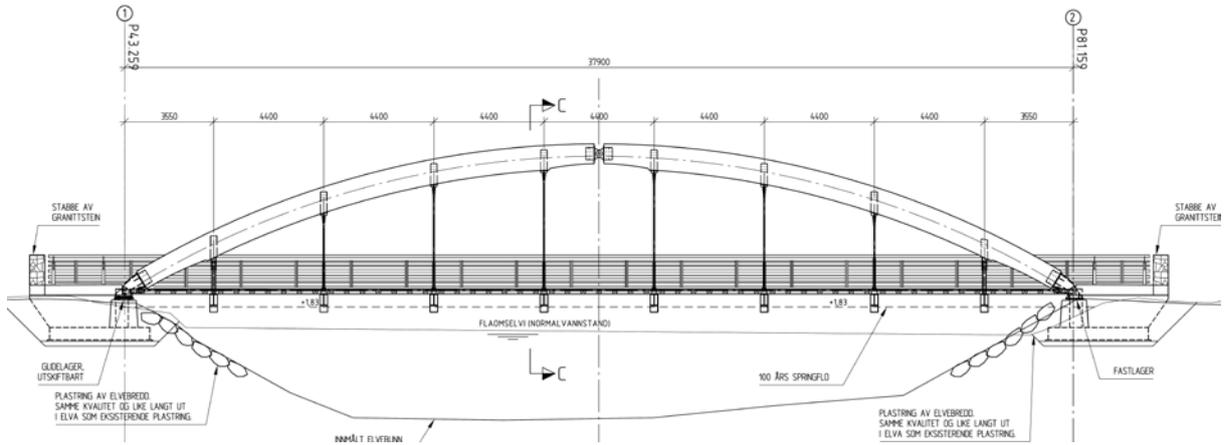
Fretheim Timber Arch Bridge has a bridge span of 37,9 m.
